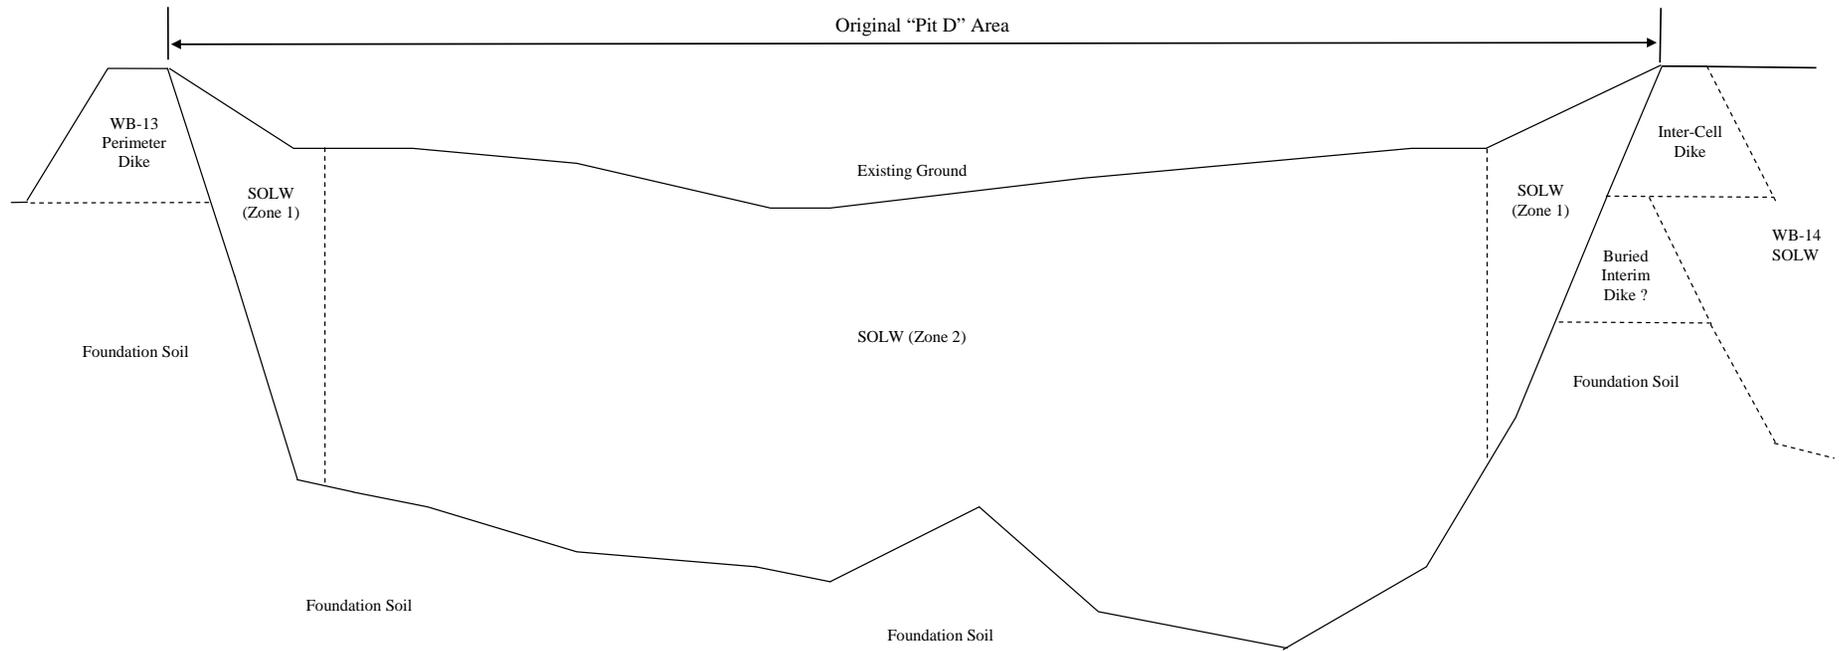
Schematic of Subsurface Profile at Cross Section B-B'
